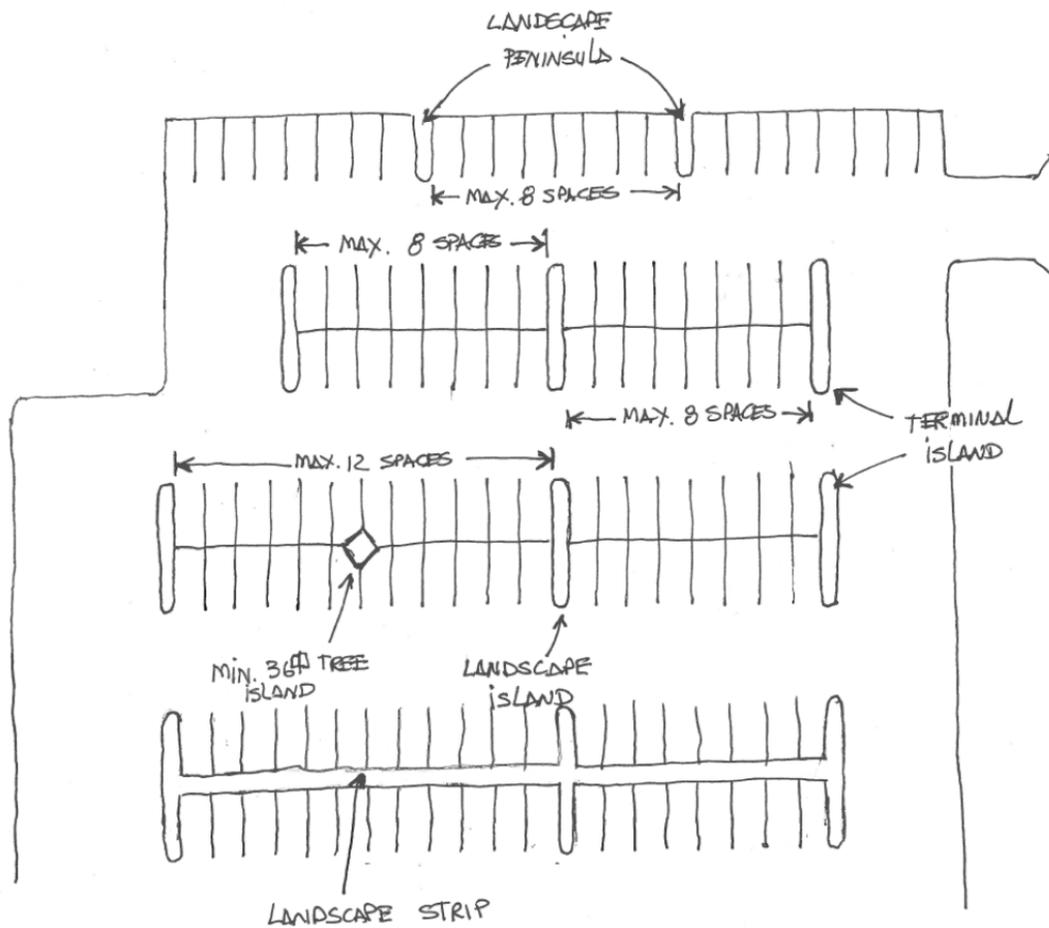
FIGURE B. INTERIOR PARKING AREA - LANDSCAPE LOCATION REQUIREMENTS
